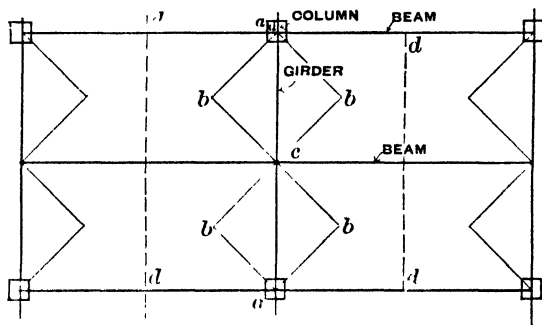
Distribution of Beam and Slab Loads to Girder. (See p. 501.)
